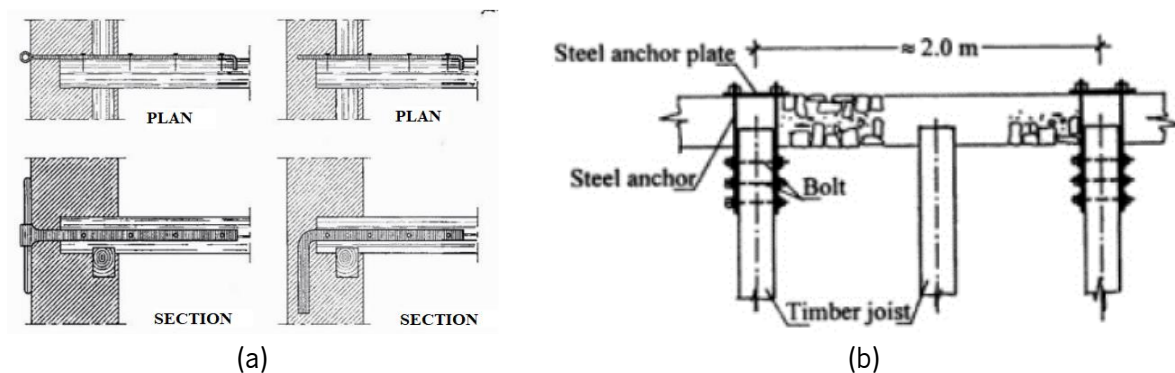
Wall-to-floor strengthening solutions: (a) wrought iron straps (Cóias 2007); (b) double anchor system (Tomažević 1999).
